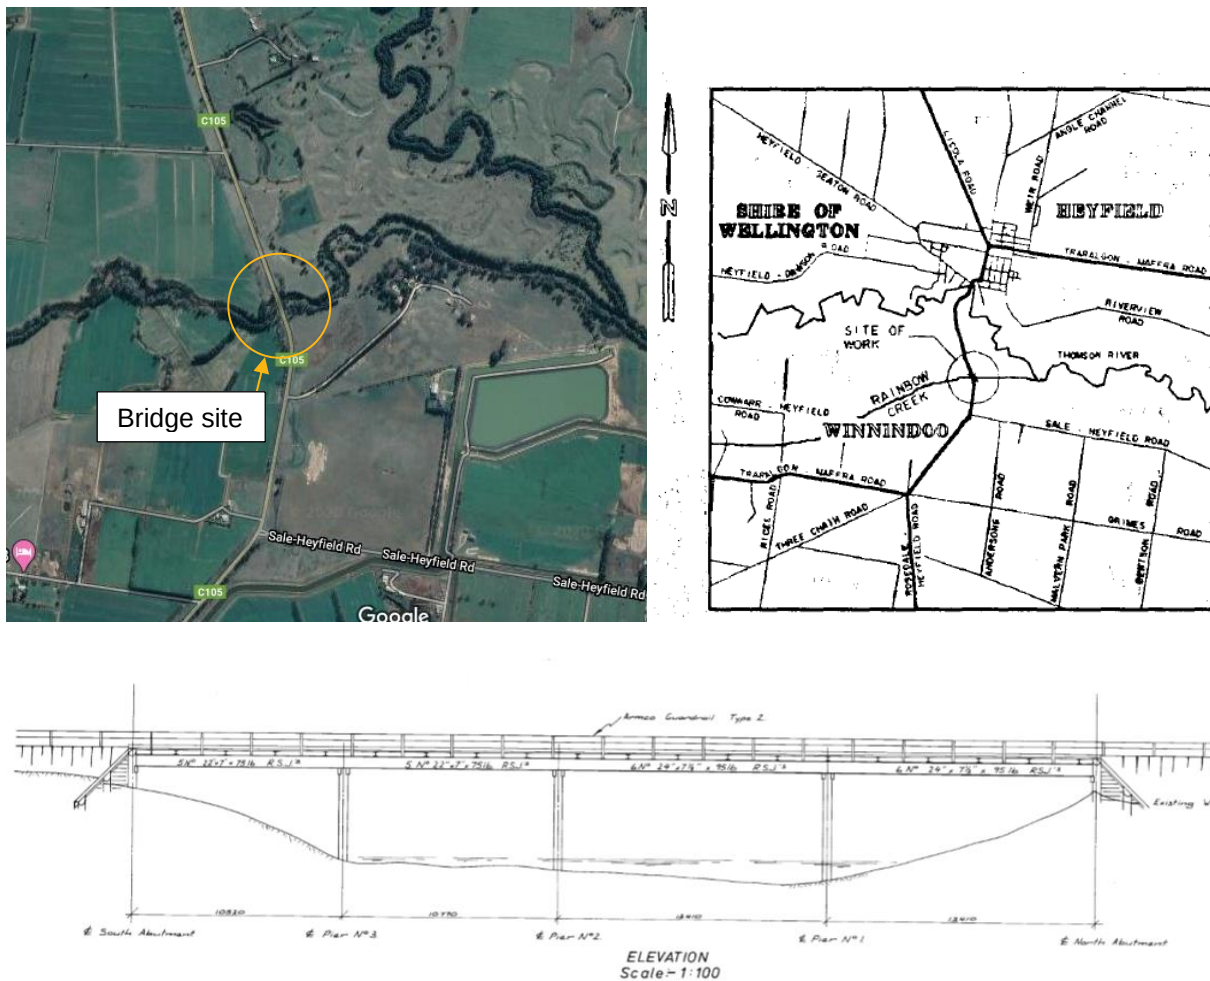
TRARALGON-MAFFRA ROAD BRIDGE SITE ON RAINBOW CREEK AND AS CONSTRUCTED DRAWING
